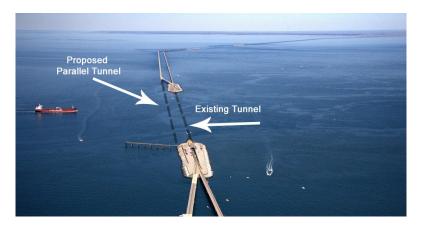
THE CHESAPEAKE BAY BRIDGE TUNNEL EXPANSION'S TUNNELS ((U.S. DEPARTMENT OF TRANSPORTATION, 2024A)
